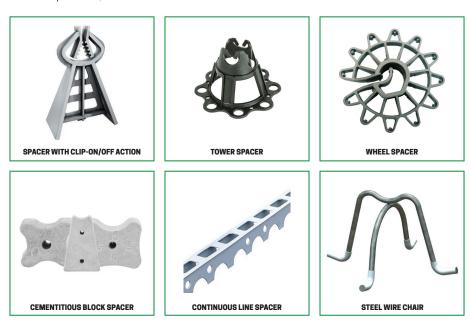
The six types of reinforcement spacers (Adapted from Alzyoud et al., 2016)
